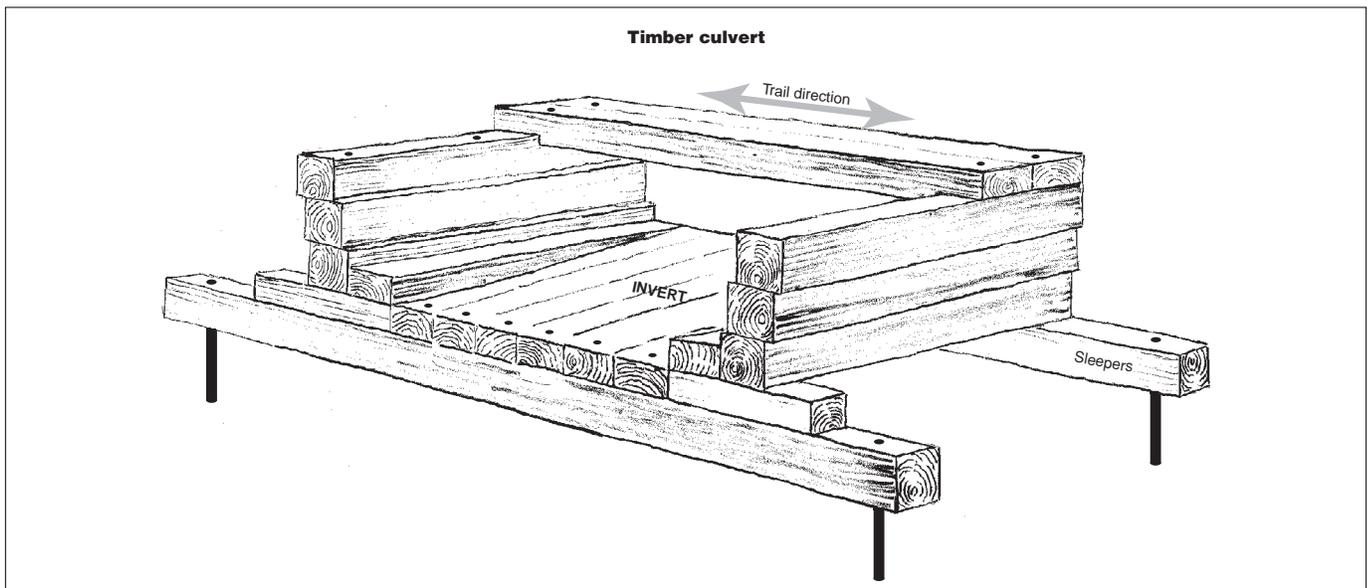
Timber culvert. The invert (bottom of the culvert) is often built level in wetlands because it is less likely to wash away in floods.
